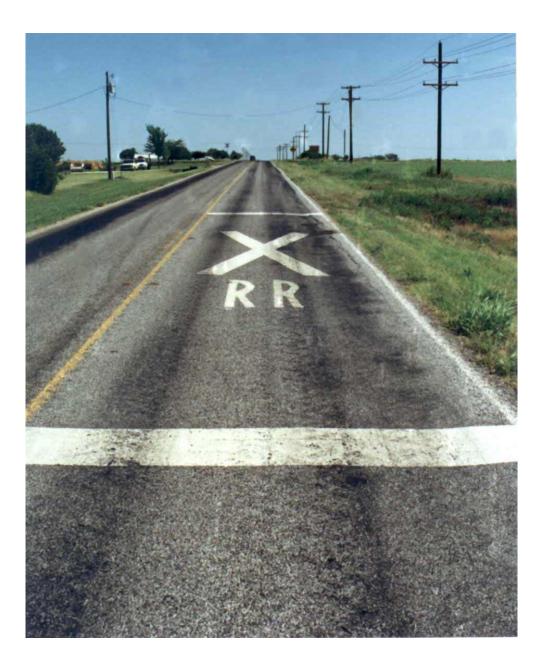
Full set of pavement markings on a roadway approach paved with either asphalt or concrete and with a traffic speed over 40 mph: "X," "RR," transverse lines, and no-passing zone lines. Some portion of the pavement markings should be directly opposite the advance warning sign but no closer than 50 feet from the crossing.
